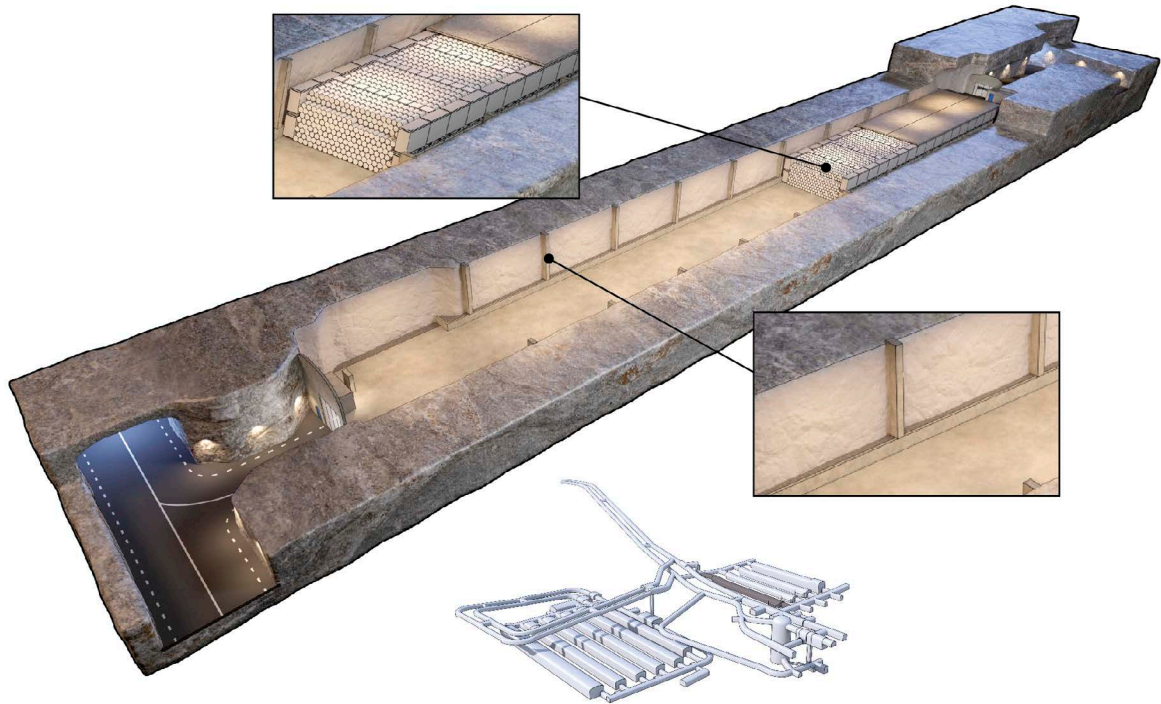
Illustration of 1BTF during the operational period. The upper detail shows the emplacement of the ash drums between concrete tanks, the lower detail shows the skirting and concrete pillars. In addition, there is a view of SFR with the position of 1BTF highlighted in dark grey.
